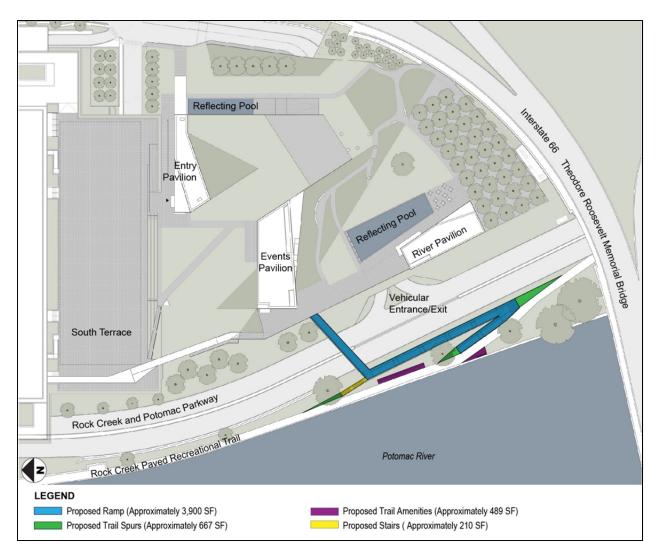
Area of Design Elements under Alternative C Requiring a Transfer of Jurisdiction
